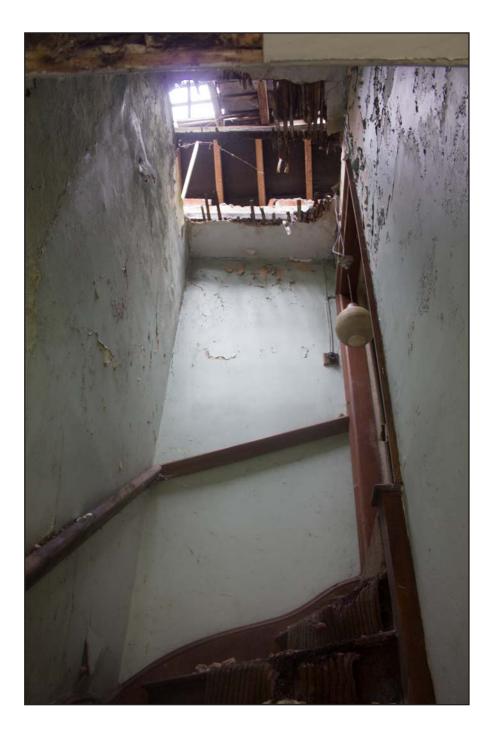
Staircase to First Floor Office - Fireplace, Estate Offices & Stables, Trevor Road, Chirk - from the west - no scale
